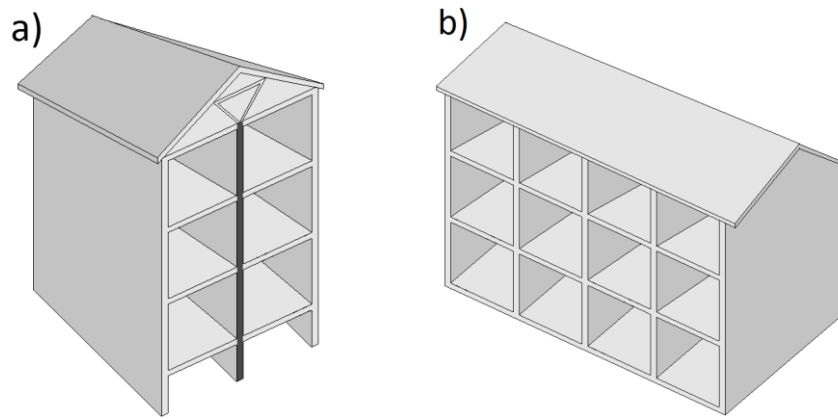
Different structural systems, a) load-bearing spine wall (dark) and façades, b) the cross-wall system that became popular during the '50s.
